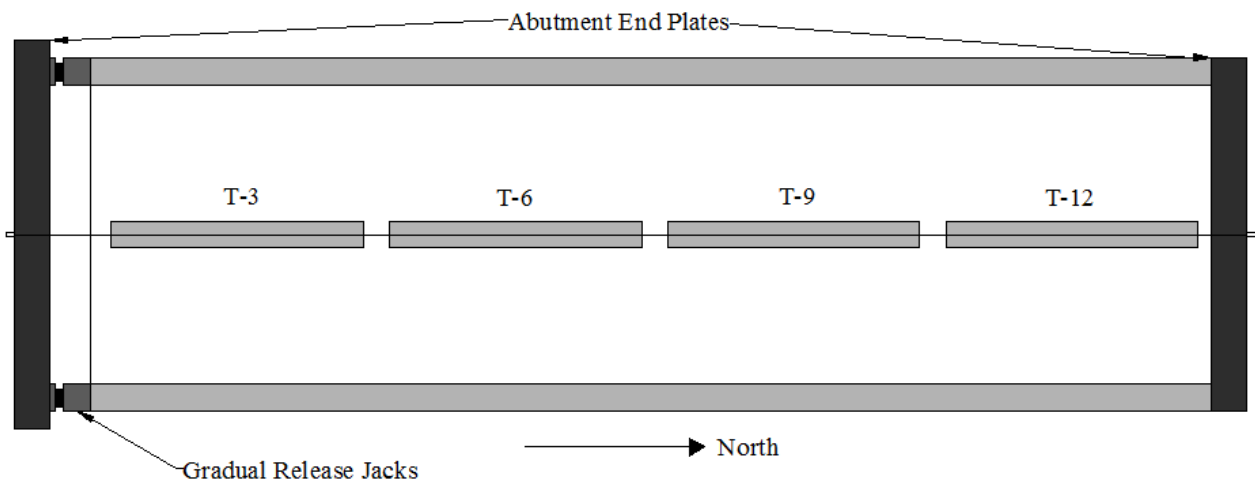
Layout of transfer length specimens in the prestressing bed
